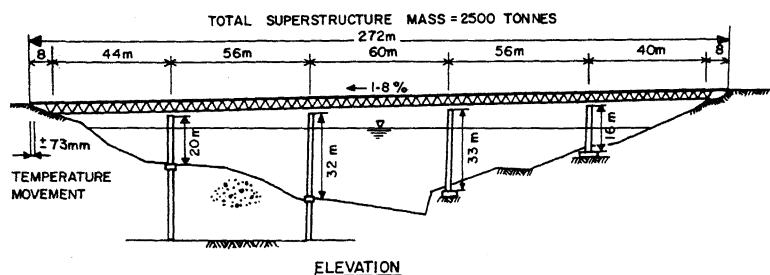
Flexural beam dampers in Cromwell Bridge (From Park and Blakeley)
